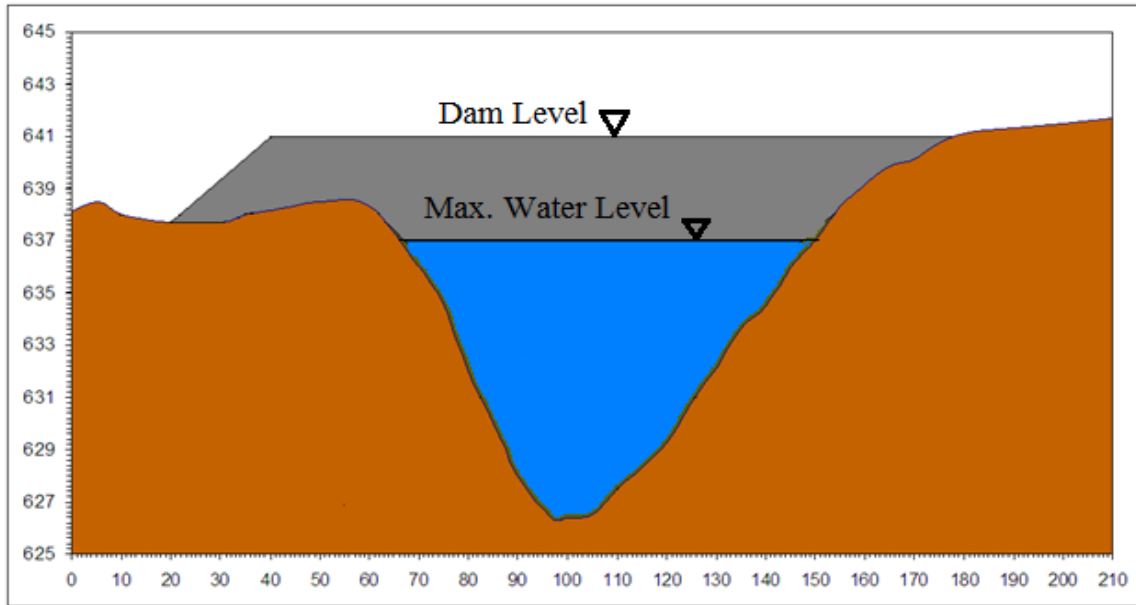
Cross – section of the dam showing the storage level and dam sections.
